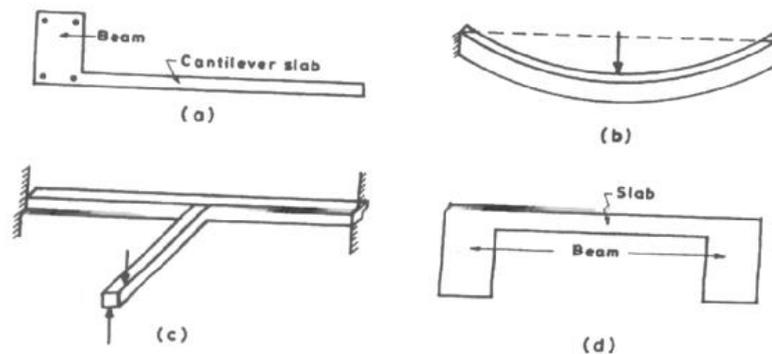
Primary and secondary torsion: (a) Portico slab; (b) Bow girder; (c) Indeterminate frame; (d) Edge beams.
